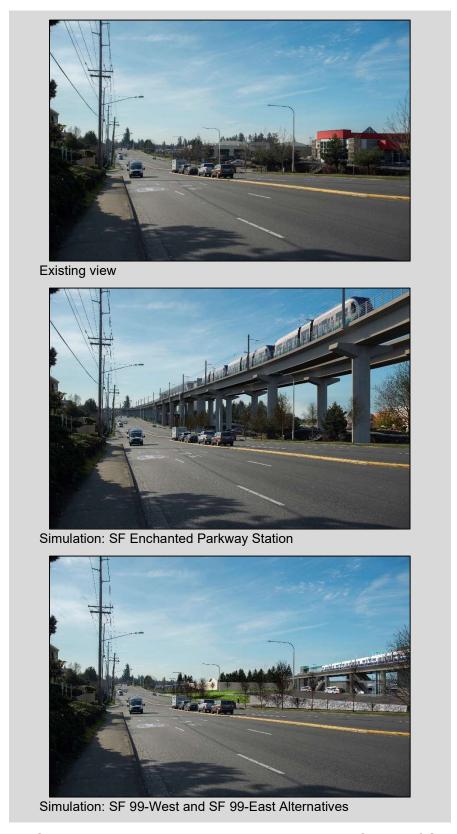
Observation Point 6 – Enchanted Parkway South of S 348th Street (looking southwest)
